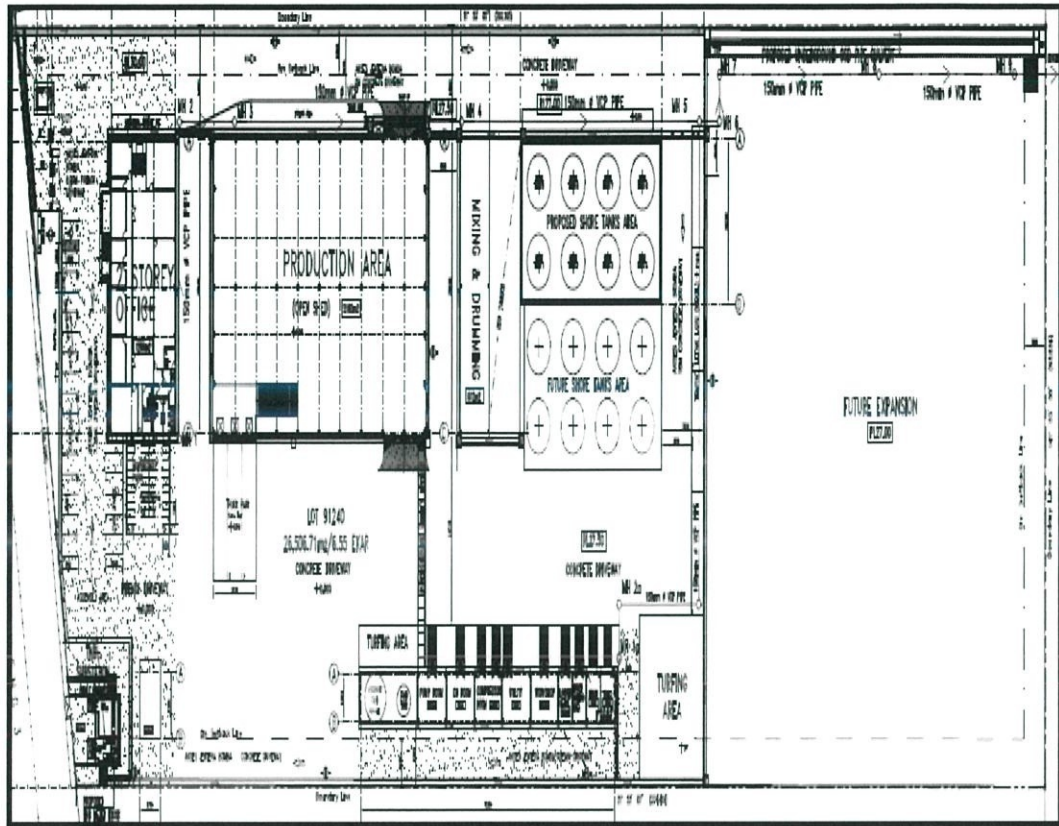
Site Plan (source: Yeo Plumber Sdn Bhd Shop Drawing)
